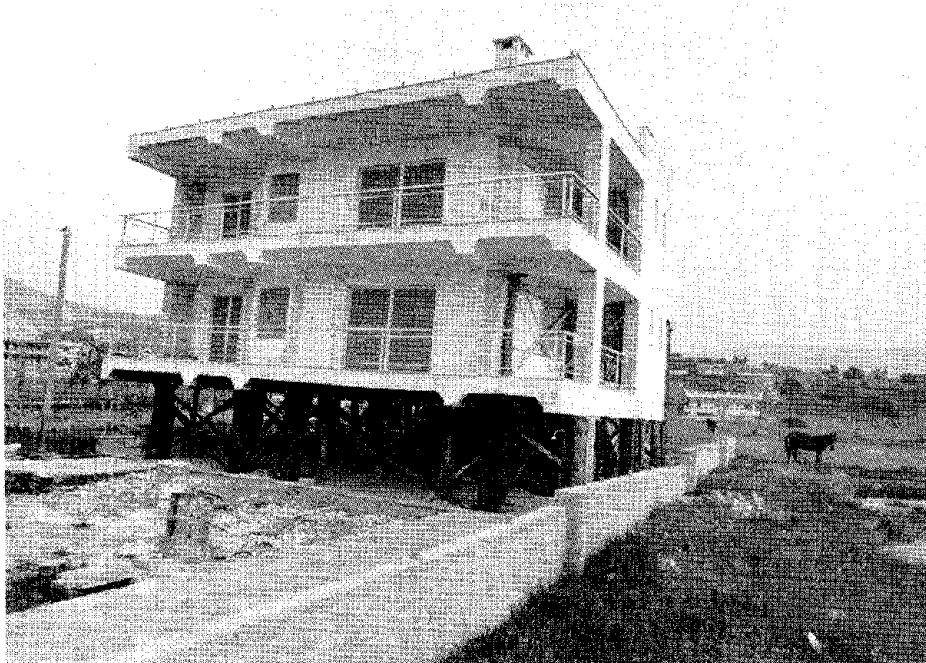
Modern resort apartment building in Alephori with open first story. The damage was limited to the lower story. The heavy scaffolding (placed after the earthquake) consists of H-shaped steel beams.
